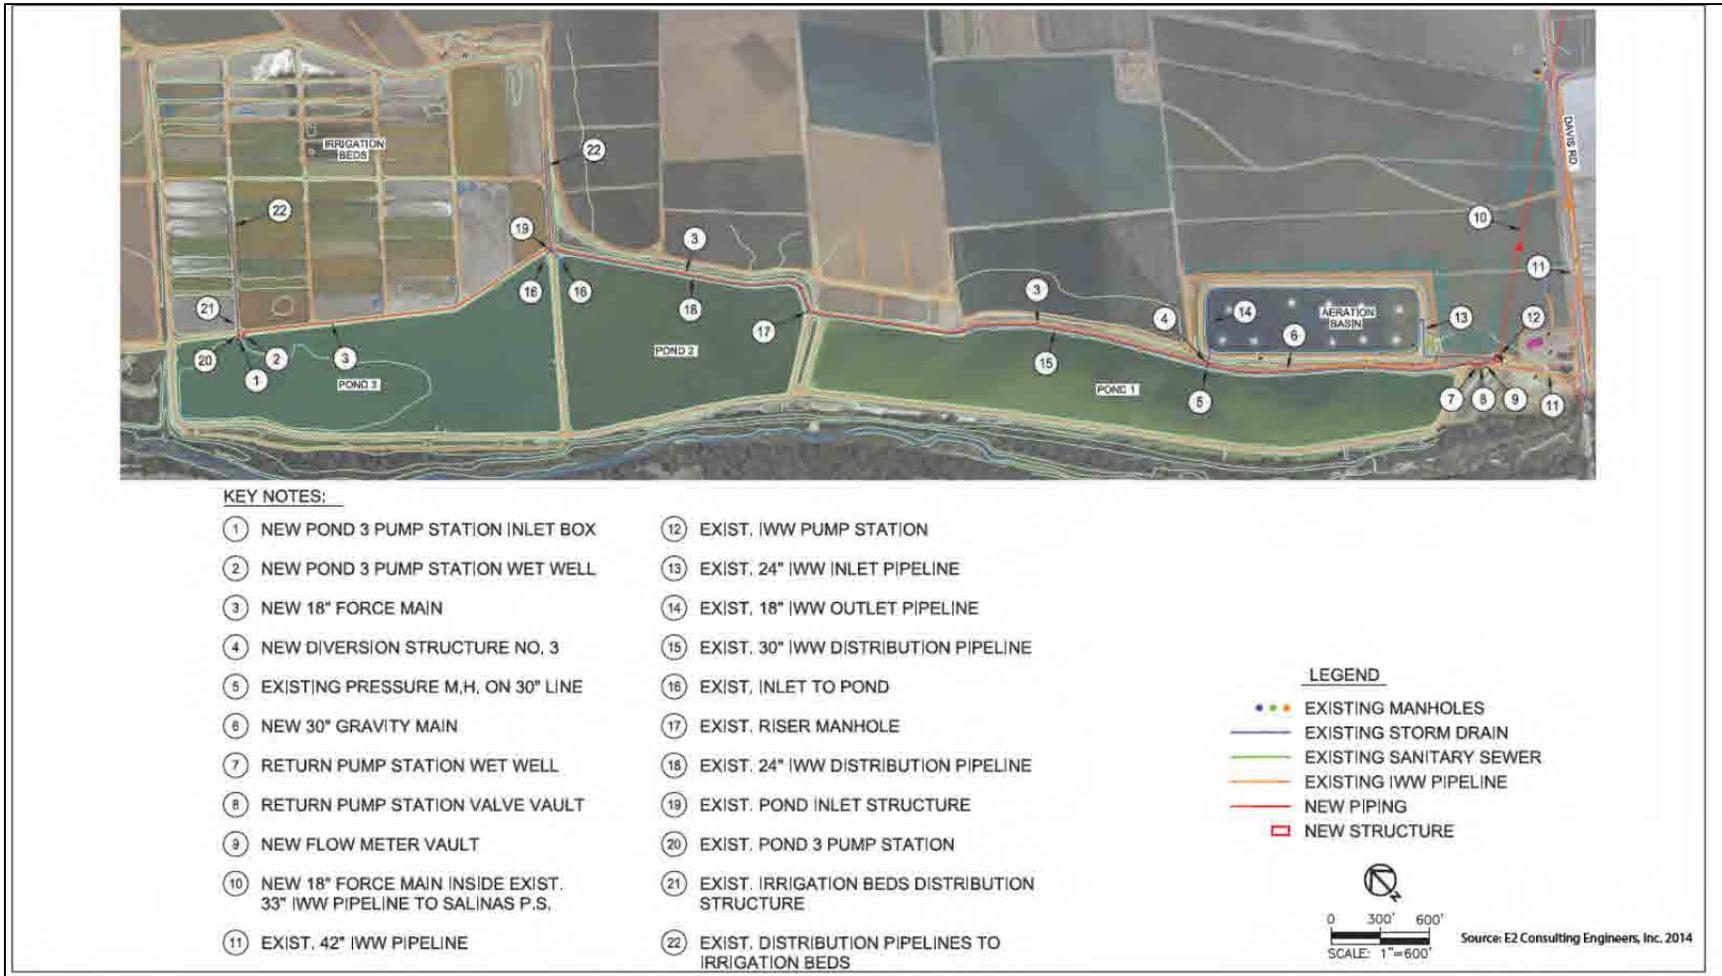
Proposed Salinas Treatment Facility Storage and Recovery Conceptual Site Plan
